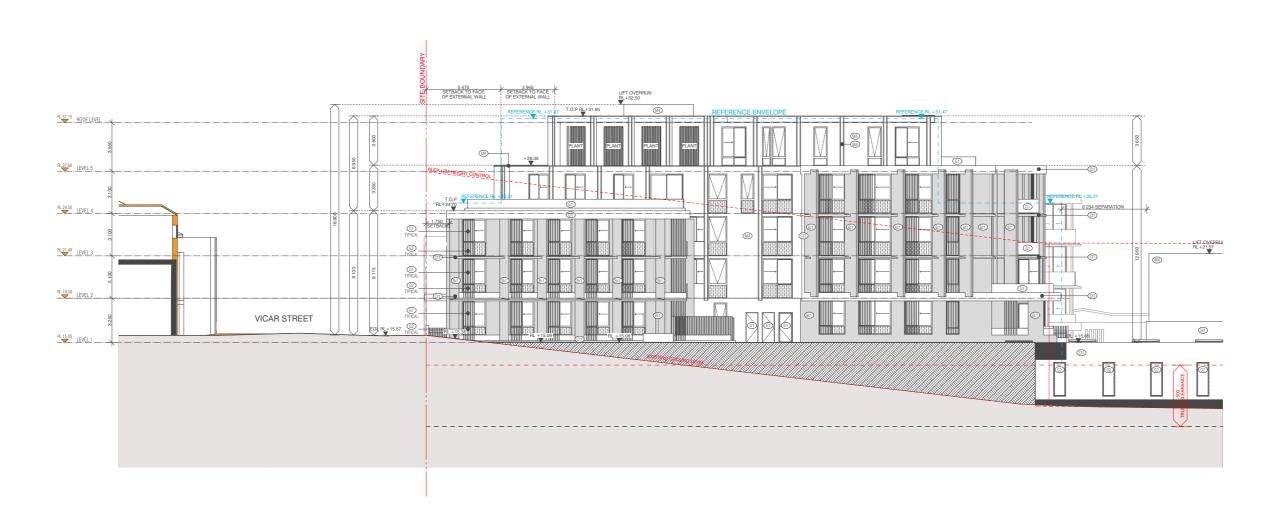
East Elevation Proposed Part 1 Fender Katsalidis
